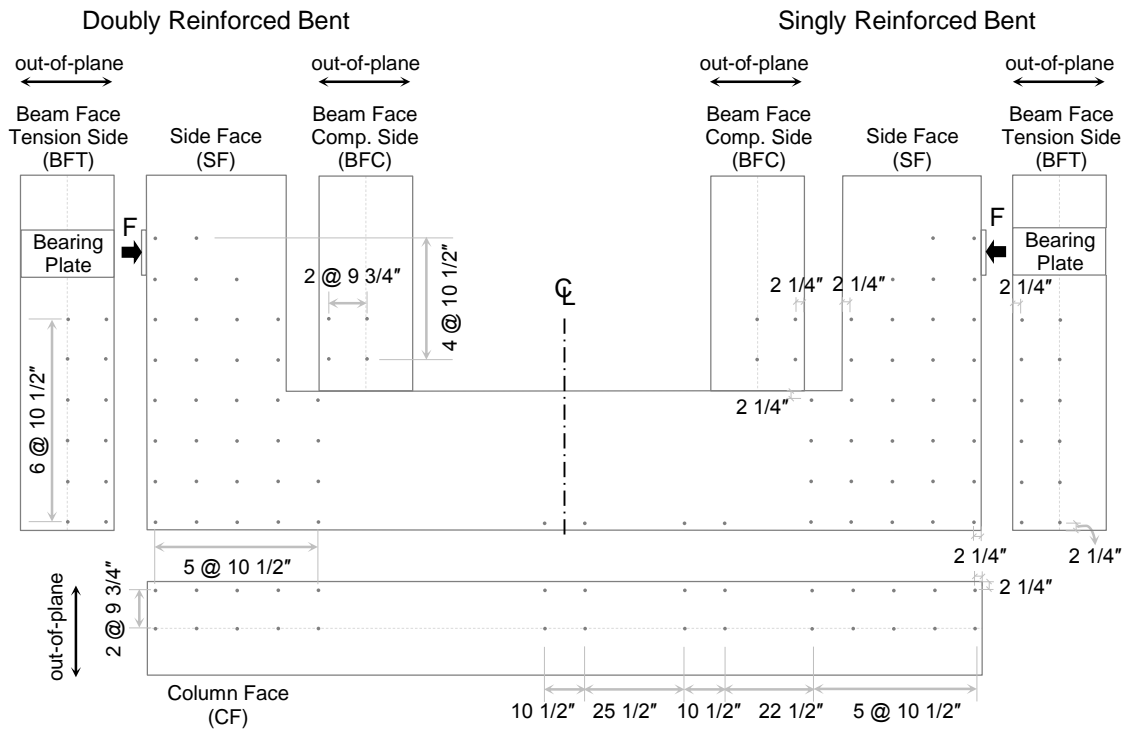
Layout of Beam, Column and Beam-Column Joint Regions
